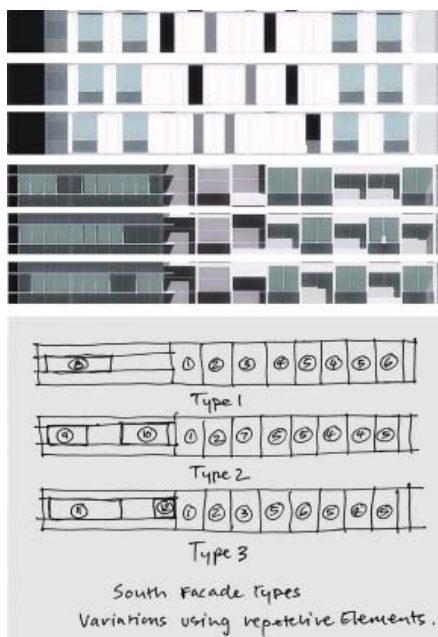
Moulmein Rise: Façade Arrangement © WOHA
